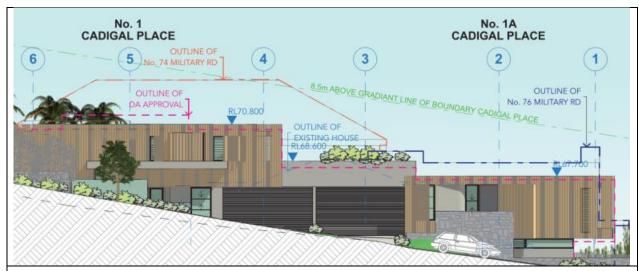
Northwest elevation showing DA approved wall height and proposed modified wall height
